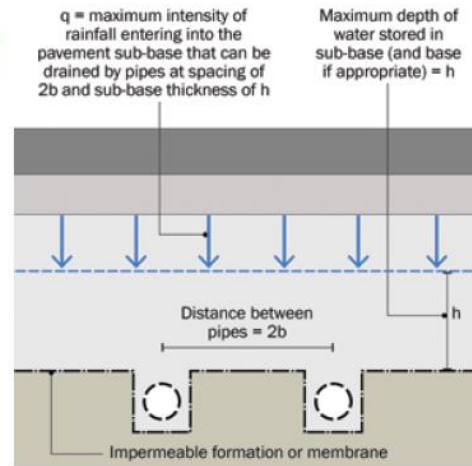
Outfall pipe spacing (after Interpave, 2010)
